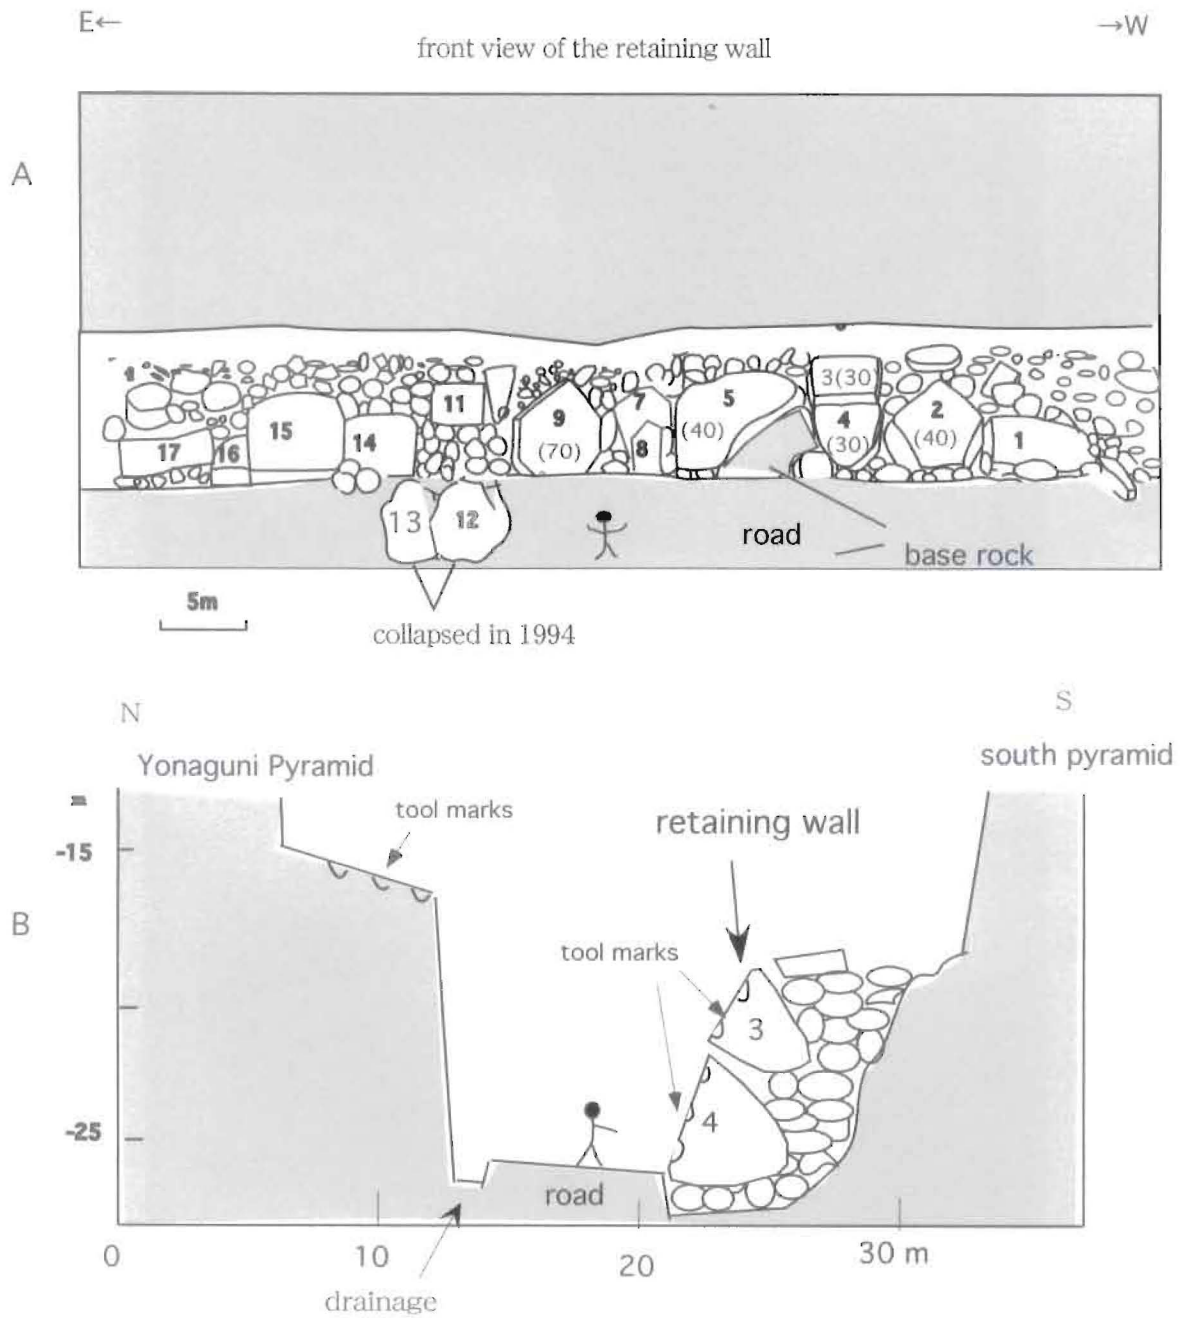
Cross section showing a road, drainage canal and retaining stone wall.
